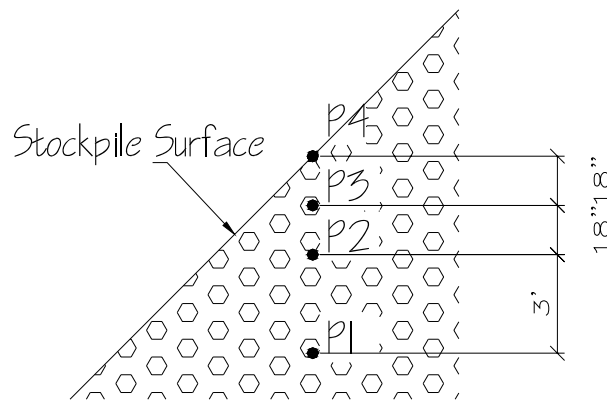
Cross-section of the Large Tire Shred-Only Stockpile (not to scale)
